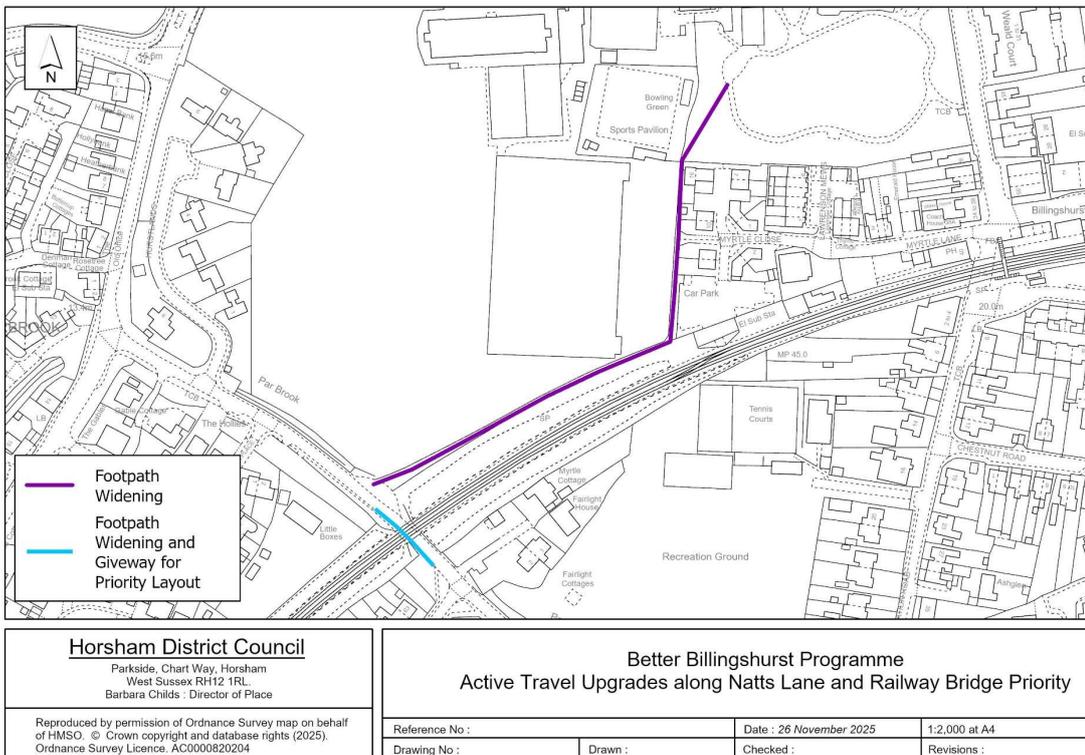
Active travel upgrades along Natts Lane and railway bridge priority
